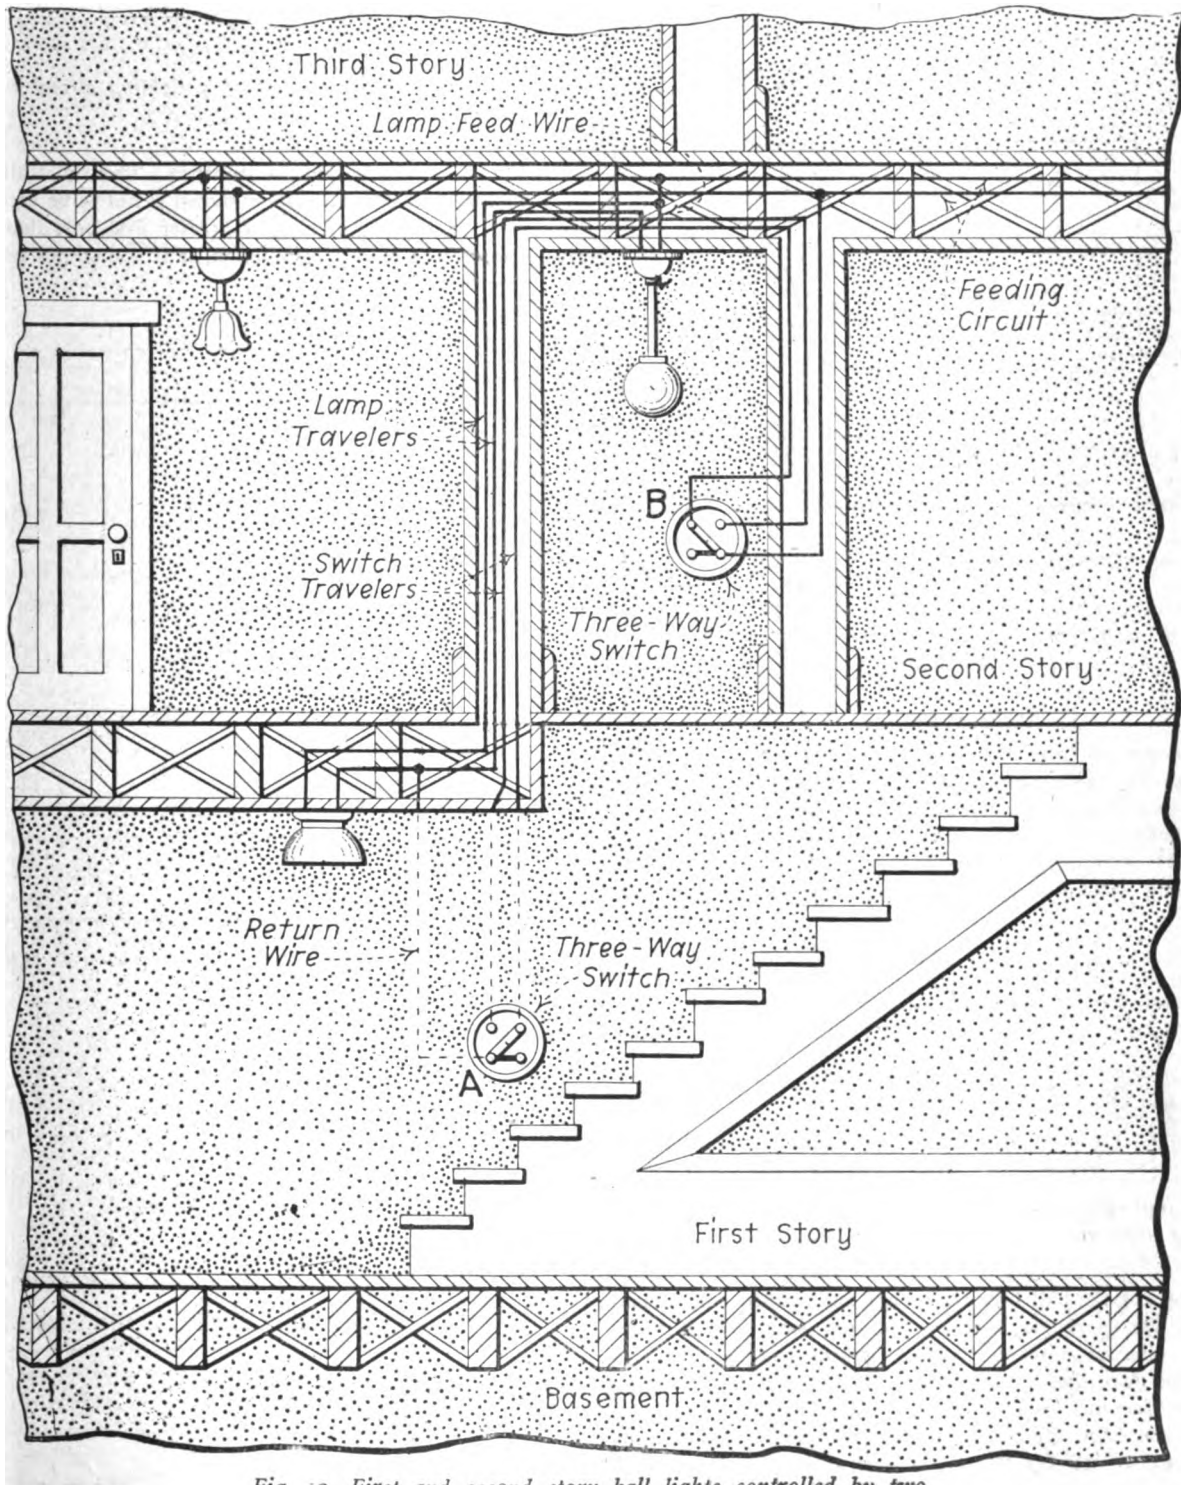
First and second story hall lights controlled by two three-way switches A and B.
